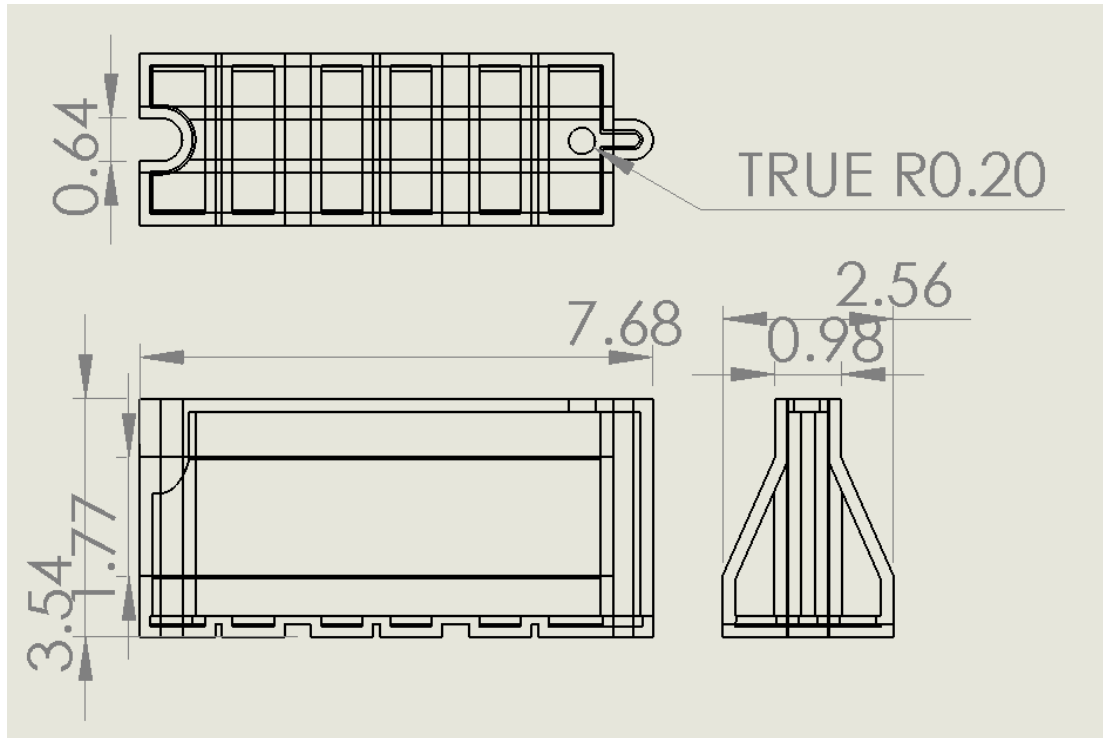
4. Dimension of the Developed Small-Scale Barrier Specimen, inches
